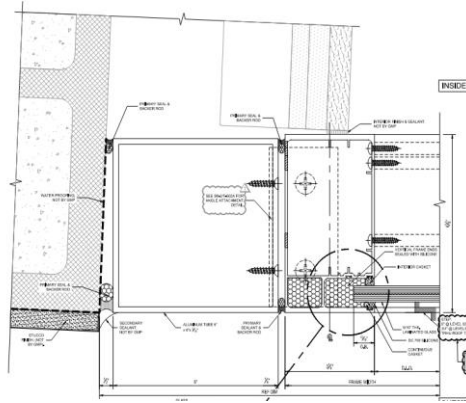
Typical Balcony Sliding Glass Door Corner Detail at Aluminum Tube Showing Frame Anchorage, Sealant Transitions, and Integration with Concrete or CMU and Interior Finishes.
